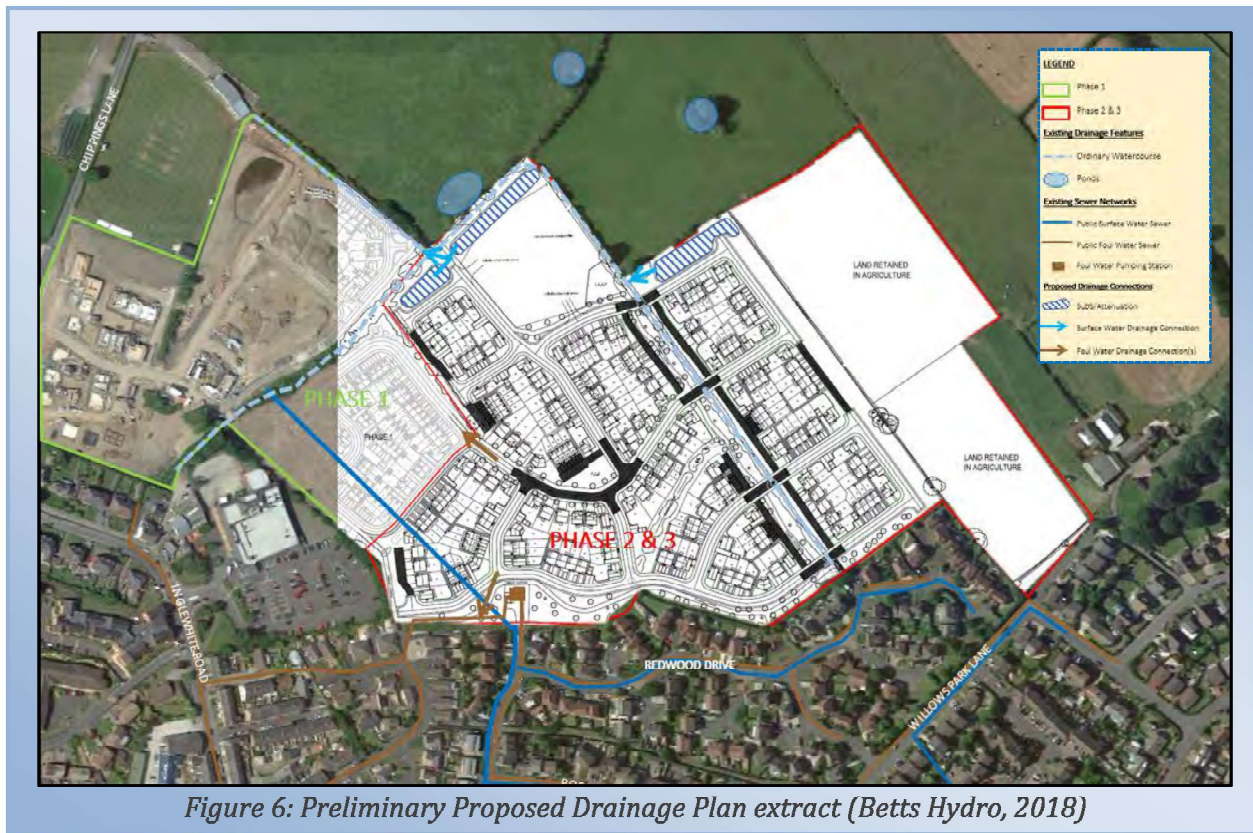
Preliminary Proposed Drainage Plan extract (Betts Hydro, 2018)
